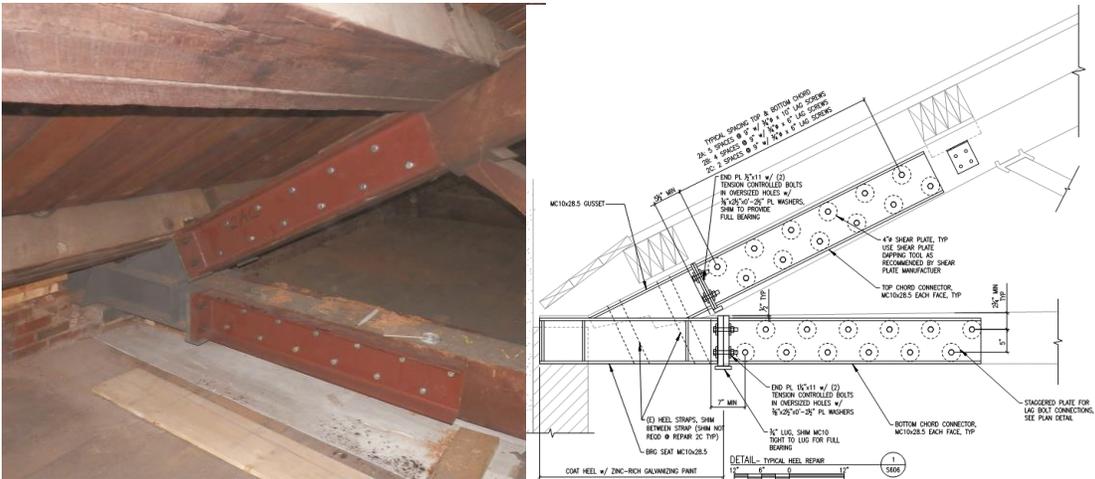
Roof truss reinforcement and bearing. (Keast & Hood 2013, with permission from Keast & Hood)
